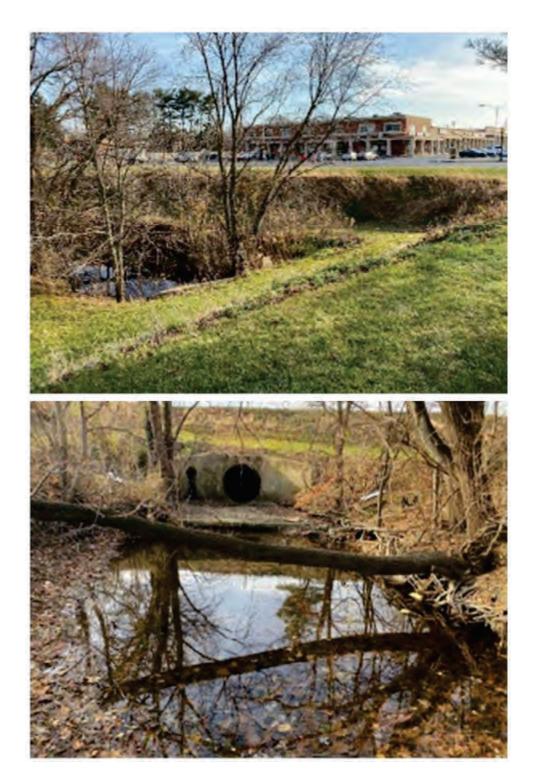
Photos of Abraham Faw Run Outfall and Existing Headwall Plunge Pool
